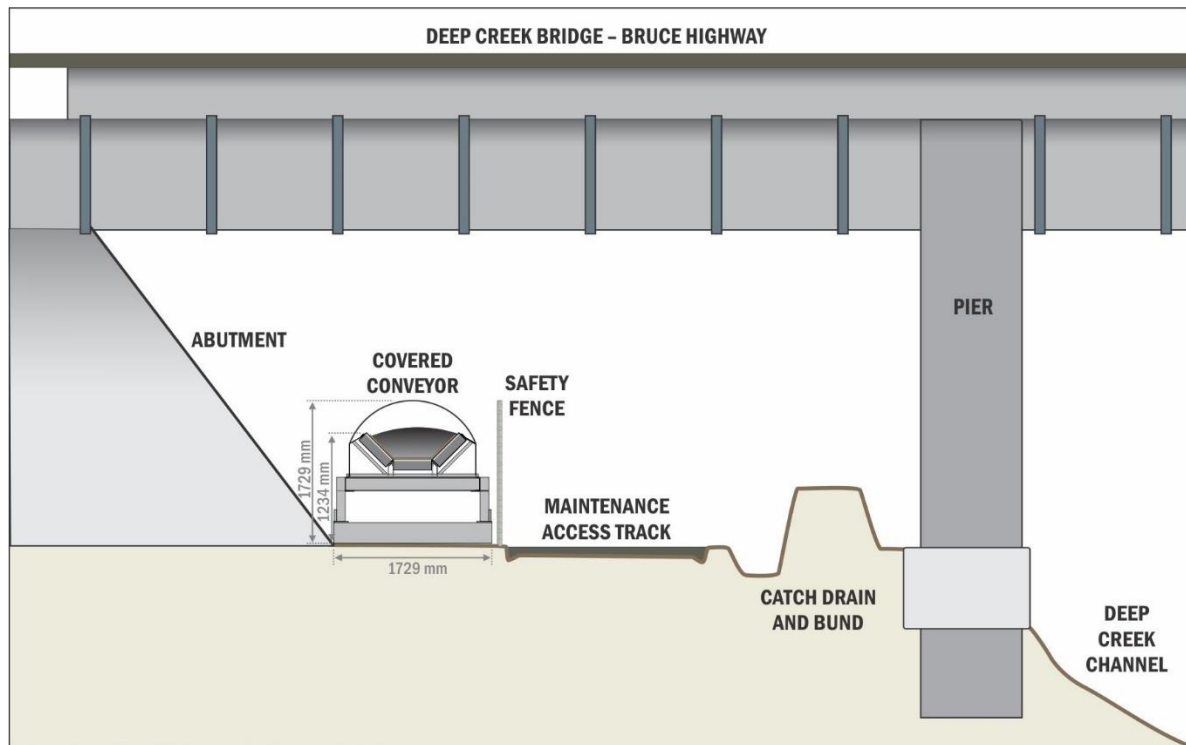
Conveyor crossing under Deep Creek road bridge
